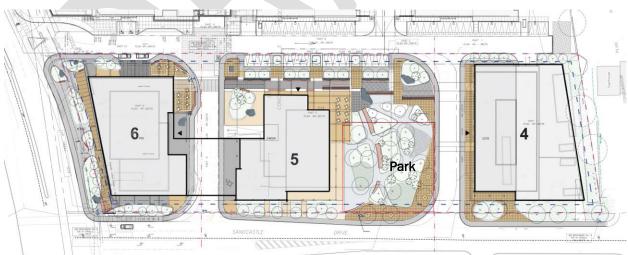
Landscaping Plan and Proposed Pedestrian Facilities
